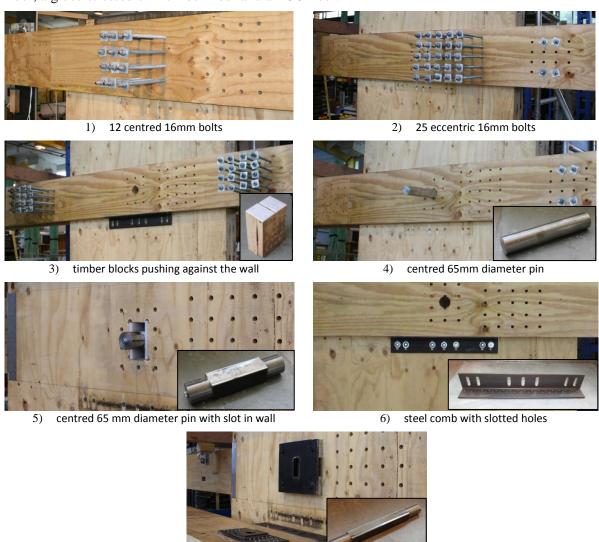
Test setup of the post-tensioned wall loaded through collector beams
